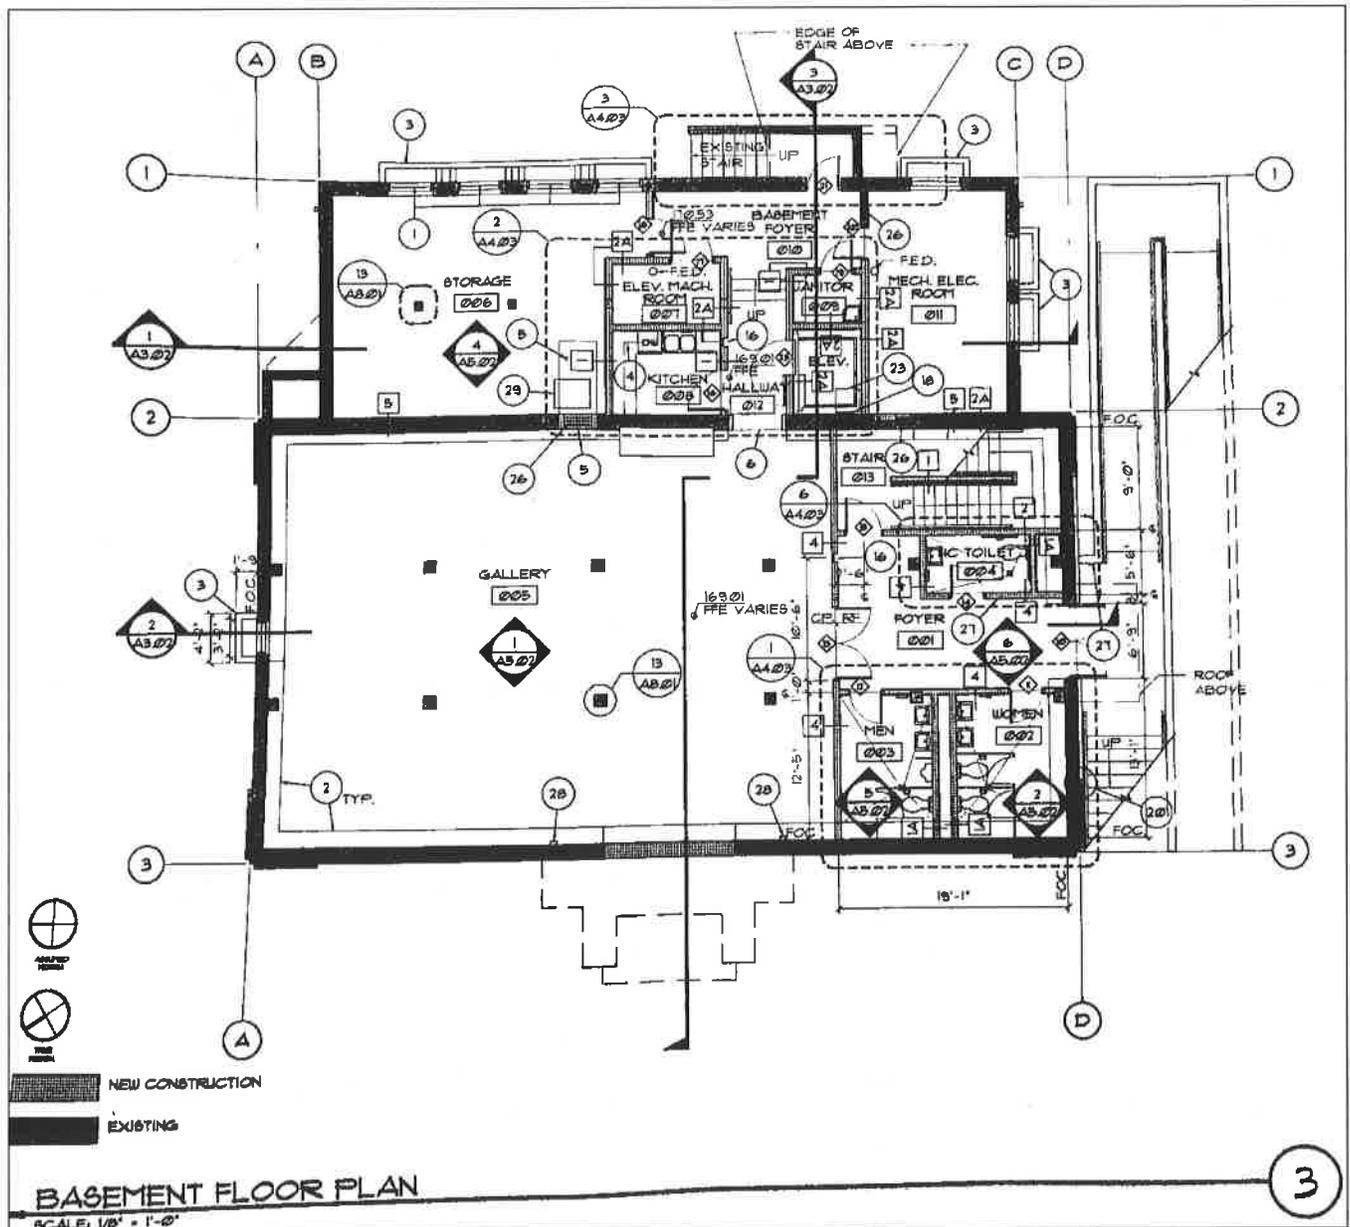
Renovated Basement Floor Plan, Slusarenko Architecture, PC, 2001.
